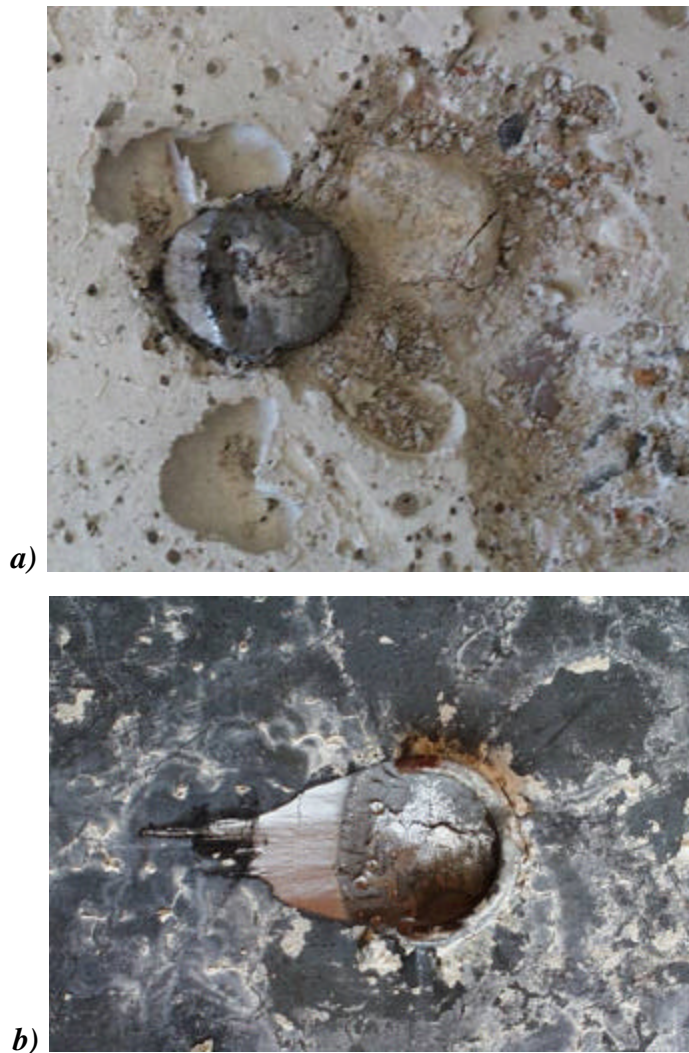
Failed Specimen CIPST15: a) concrete block, b) steel plate
